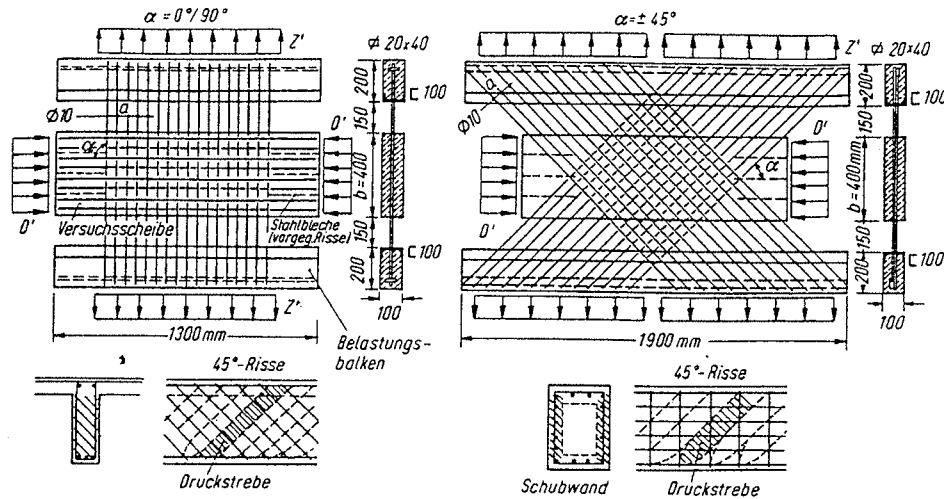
Reinforcement details and load principle in [83,2]
